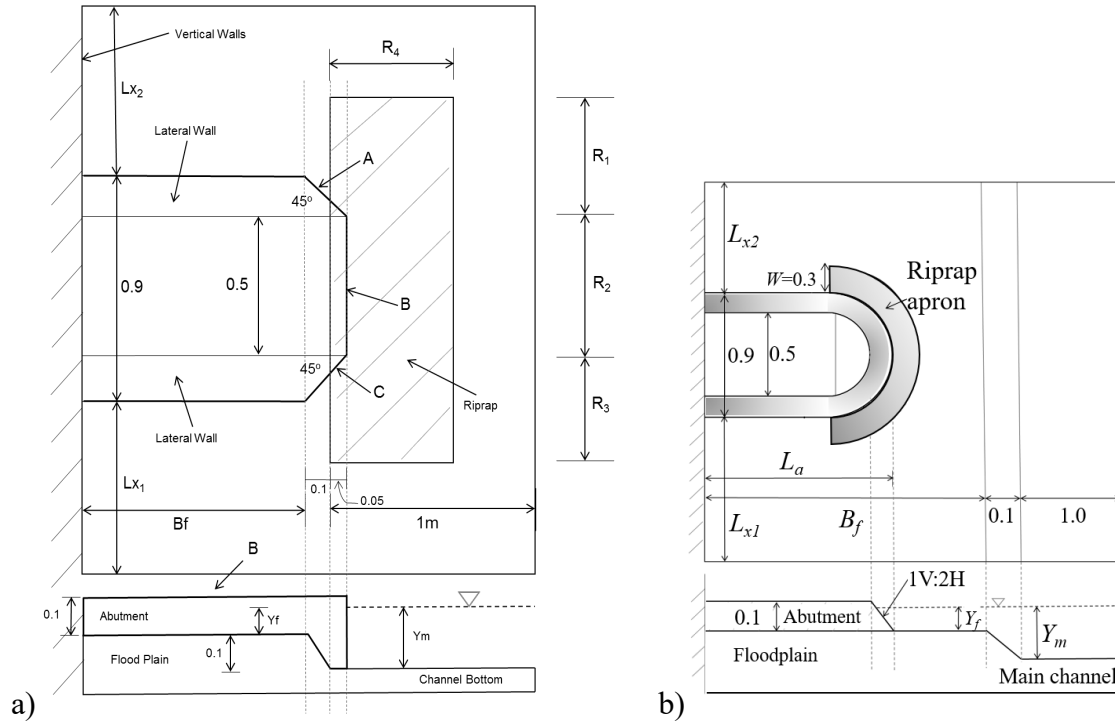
Sketch showing general layout of the preliminary numerical simulations performed for a wing-wall abutment (left) and for a spill-through abutment (right) placed on the floodplain of a straight channel. Dimensions are in meters. The wing-wall abutment geometrical set up corresponds to that used in the laboratory experiments of Melville et al. (2007). Reproduced from Wu et al. (2020) and Wu et al., (2021).
